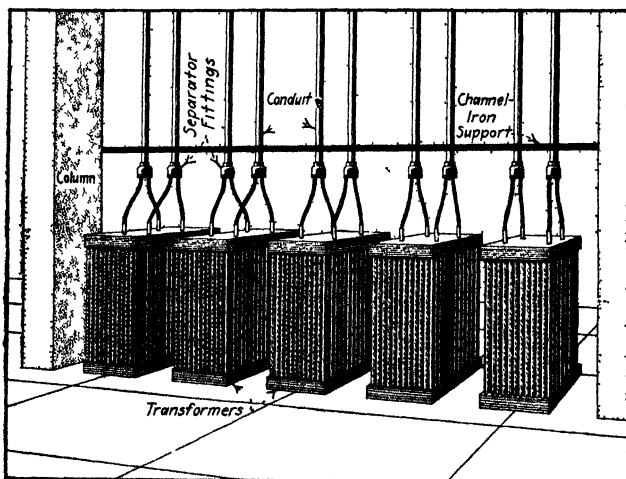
Arrangement of transformer leads—a good example of exposed open conduit work.
